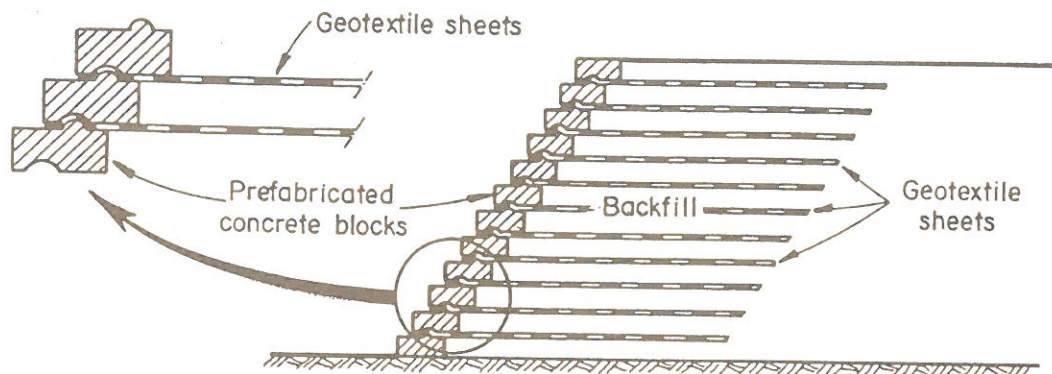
Reinforced soil wall using geotextile sheets and a concrete block facing
